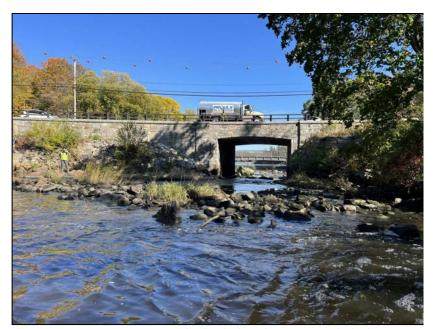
Downstream area of the dam looking downstream at the bridge carrying Newmarket Road.
